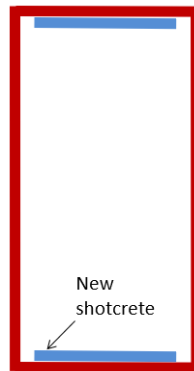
Figure showing Retrofit Situation 1 plan.
